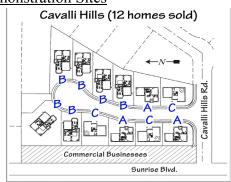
Footprint of A, B and C style homes built by Evans Construction.
